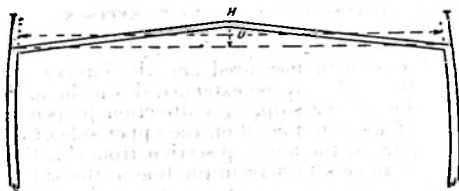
H, height of pitch of beam; U, the upper breadth through one-half height of pitch
